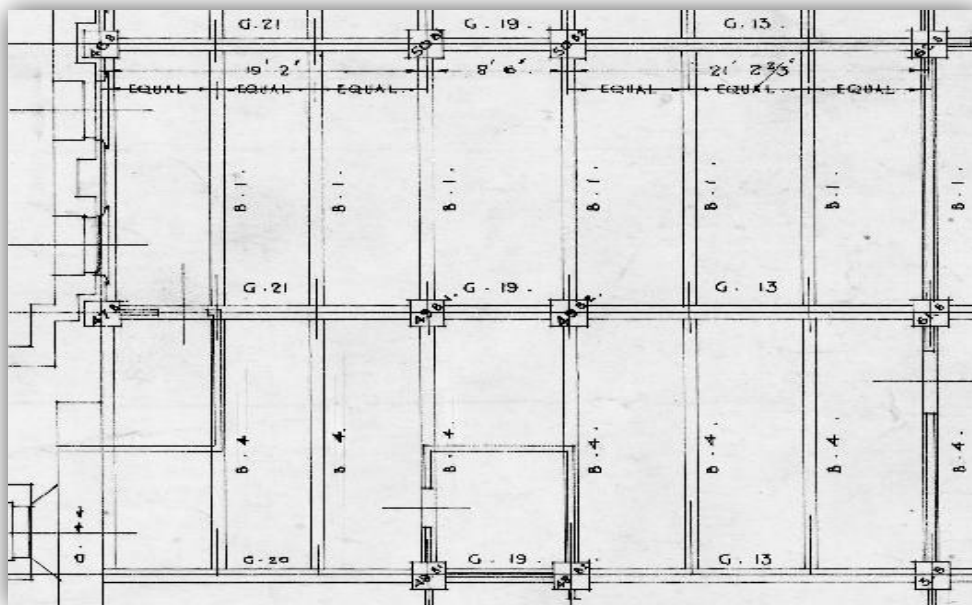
Brisbane City Hall typical floor beam layout (Source: Brisbane City Council, Cartwright & Belperio 2012)
